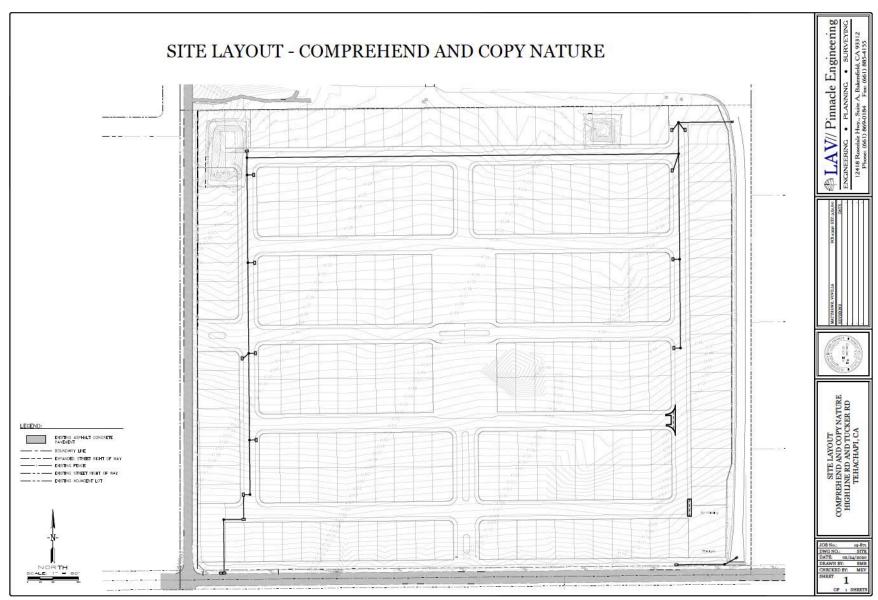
CLIENT PROVIDED SITE LAYOUT
